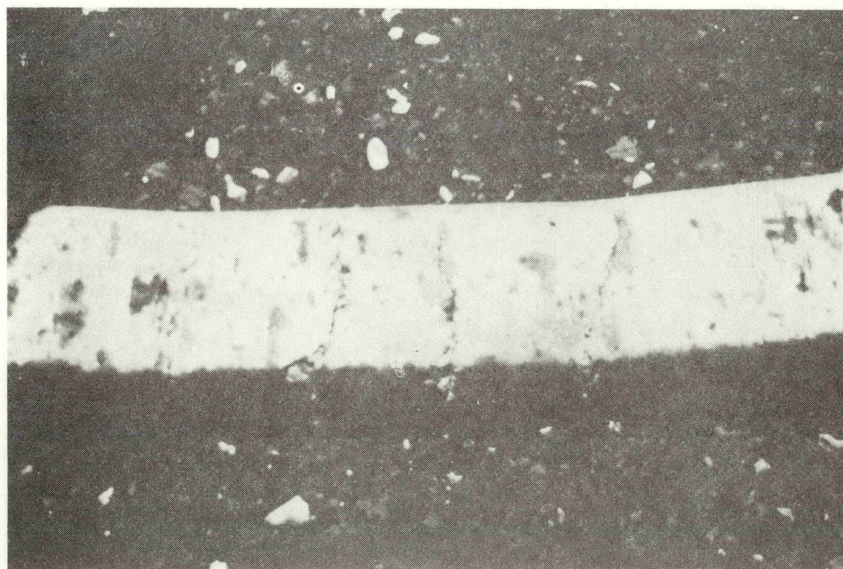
Tie Center Cracks due to bending - volcanic cinder ballast (1)
